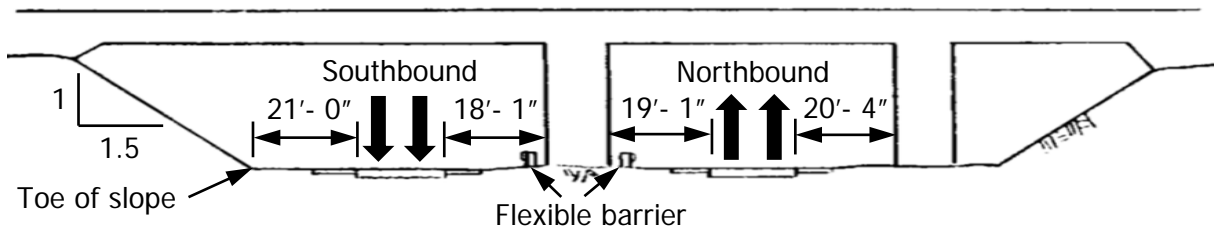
Bridge elevation view of horizontal clearances for separate southbound and northbound highway features below the bridge, with flexible barriers.
